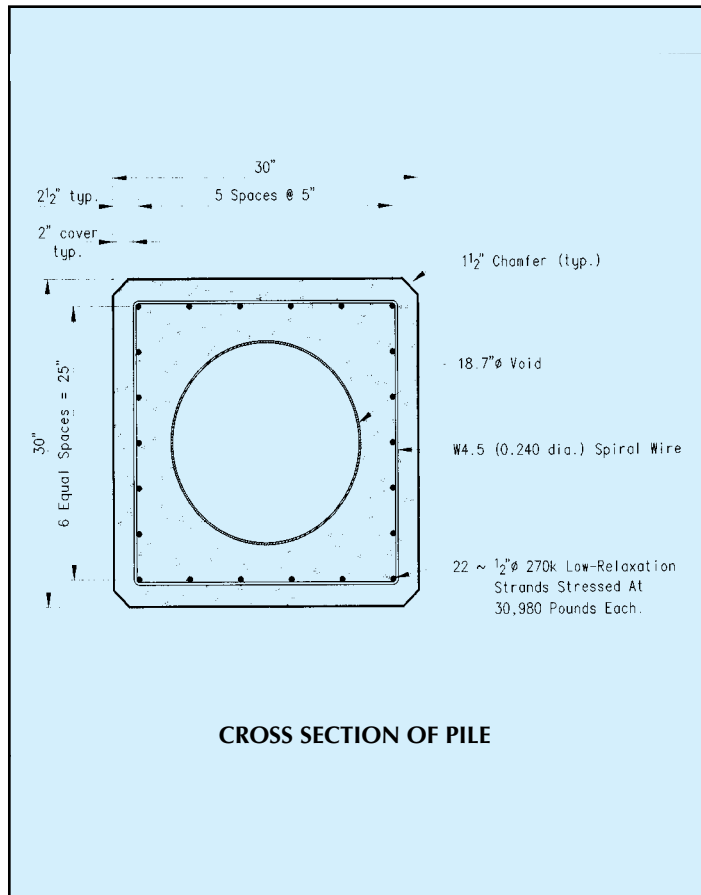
Cross section of 30 in. (762 mm) square hollow prestressed concrete pile showing prestressing steel and mild steel reinforcement.
